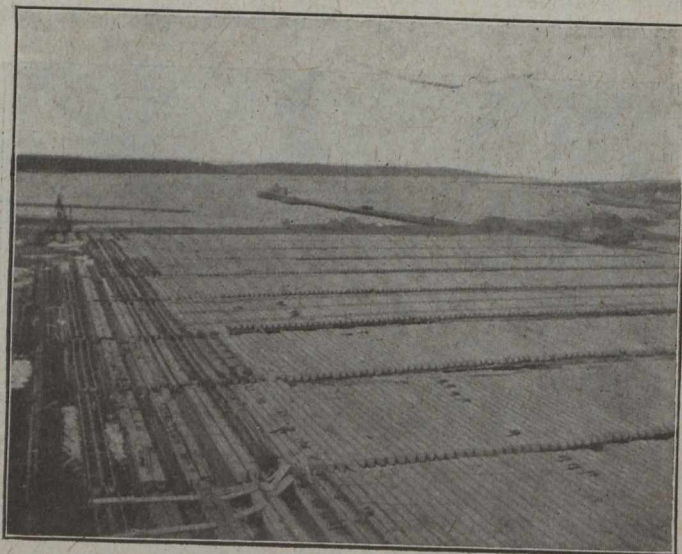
Pier No. 2—Pile Yard—Camber Piles
